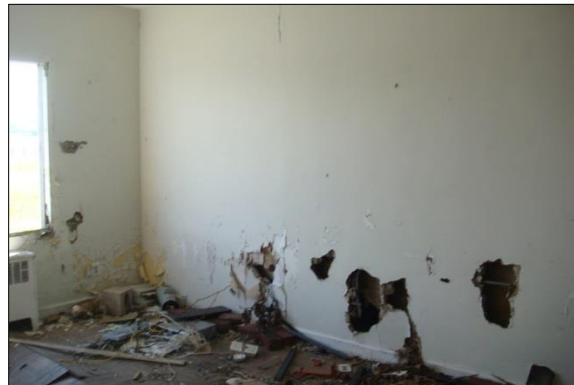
Triplex, facing southeast inside the living room of Unit 44A, June 18, 2014.
